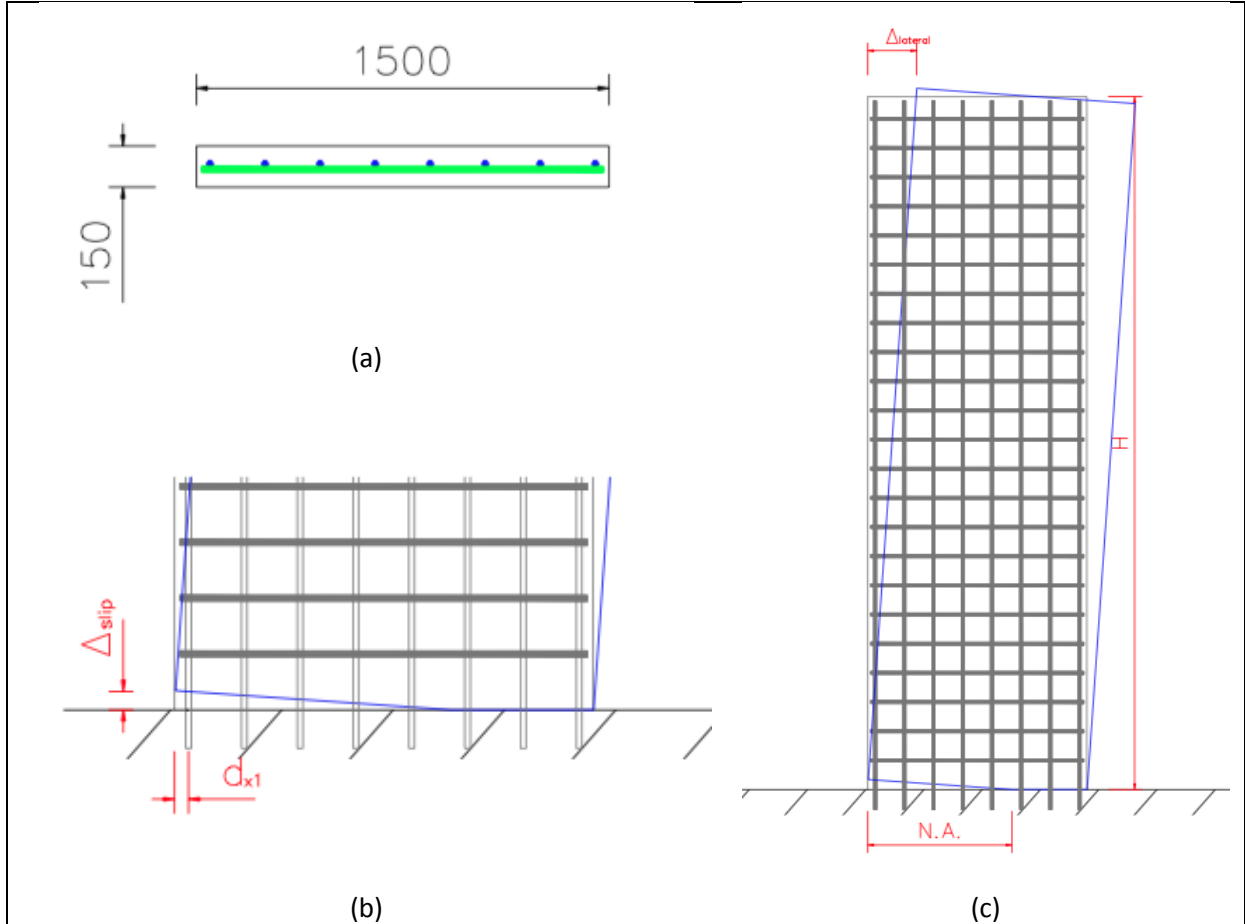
Details of the example wall: a) reinforcement and geometry, b) formation of a single crack at the wall base, and (c) expected deflected shaped.
